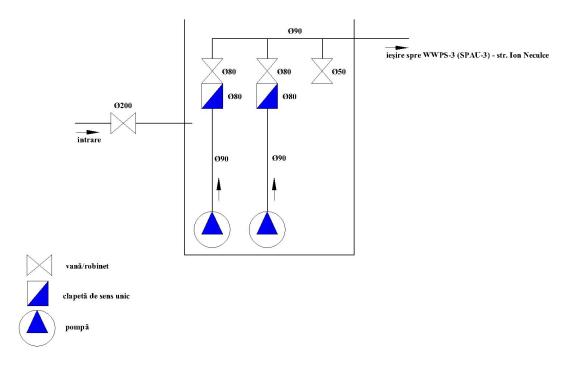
Hydraulic Scheme with existing equipment of WWPS-1 – Tereza Sobolevschi The list of existing equipment on the station from which the signals to DACE must be received:
